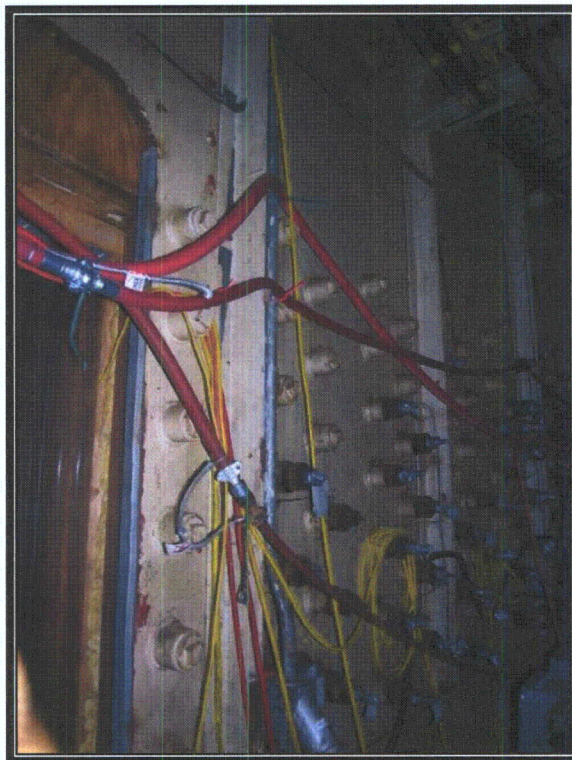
Instrumentation connections in wall of containment building (Photograph by RCG&A, 2008)
